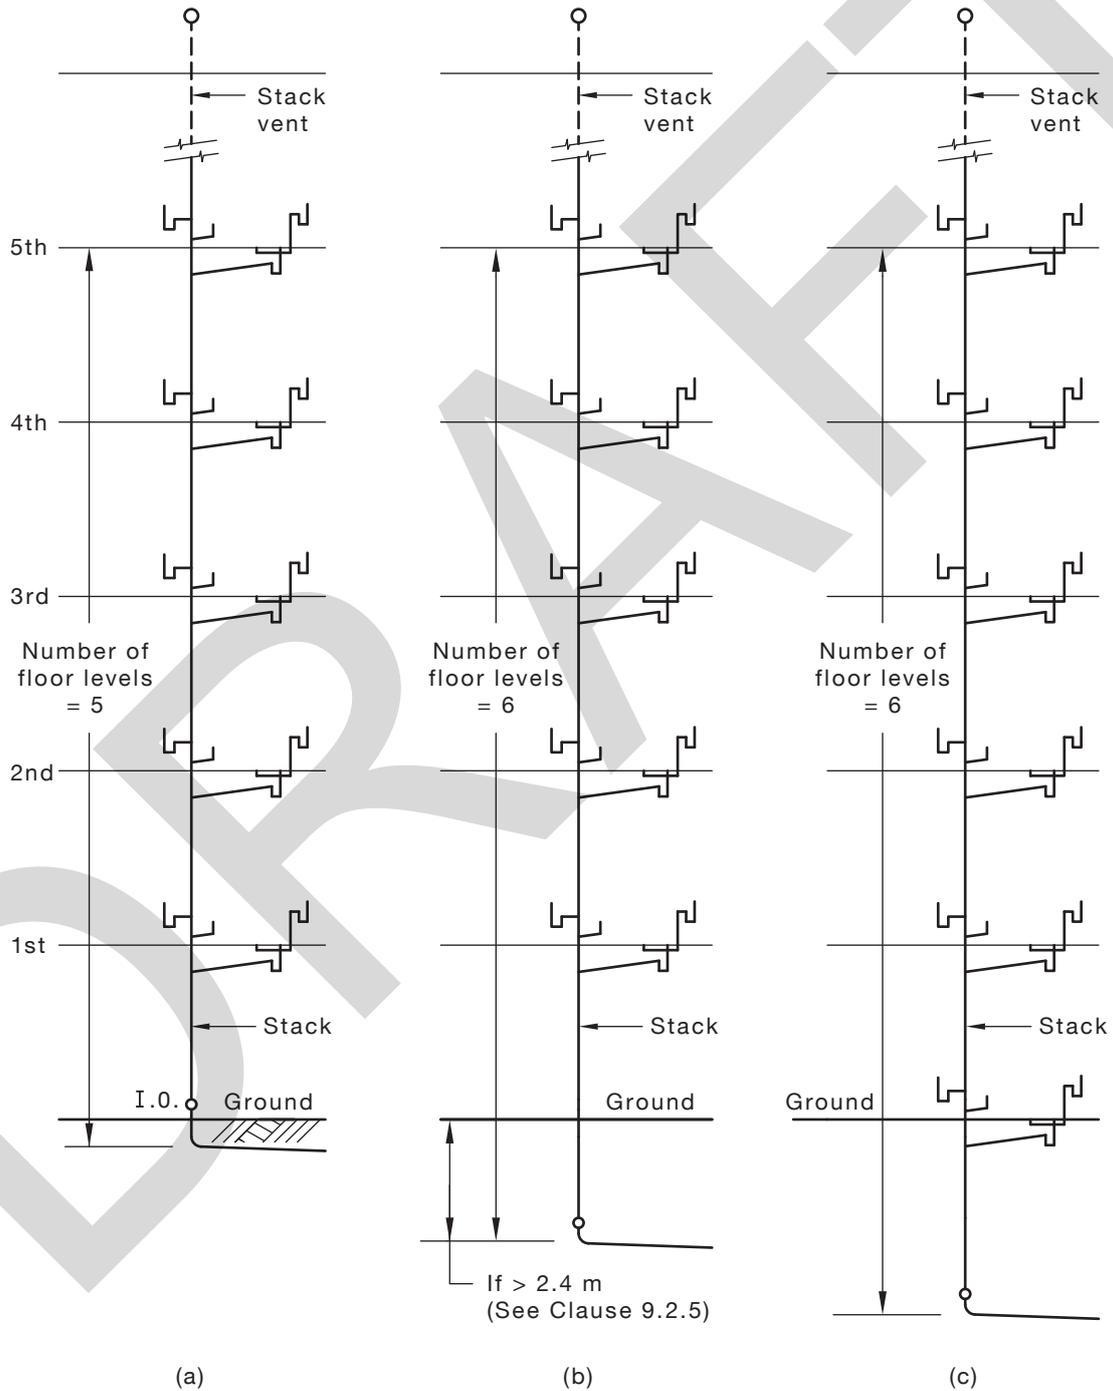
EXAMPLES OF NUMBER OF FLOOR LEVELS
